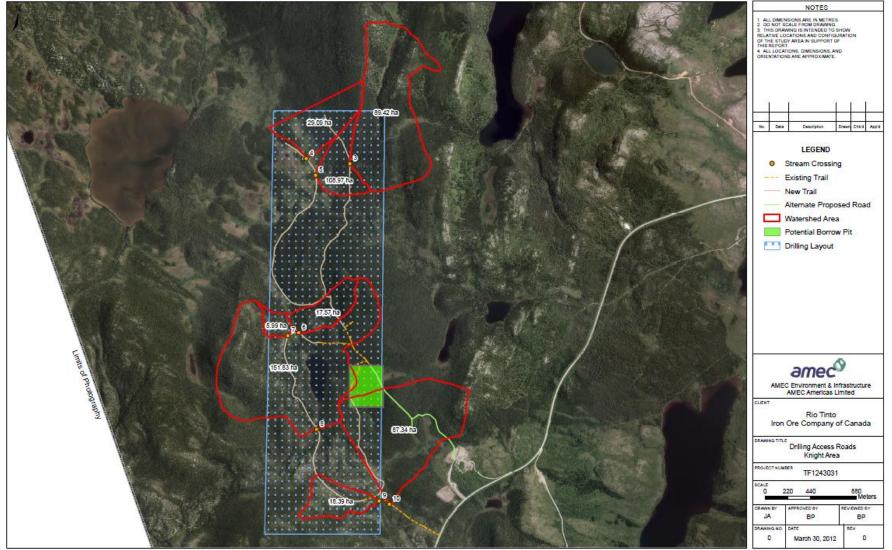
Proposed Drilling Access Roads for the Knight Area.
